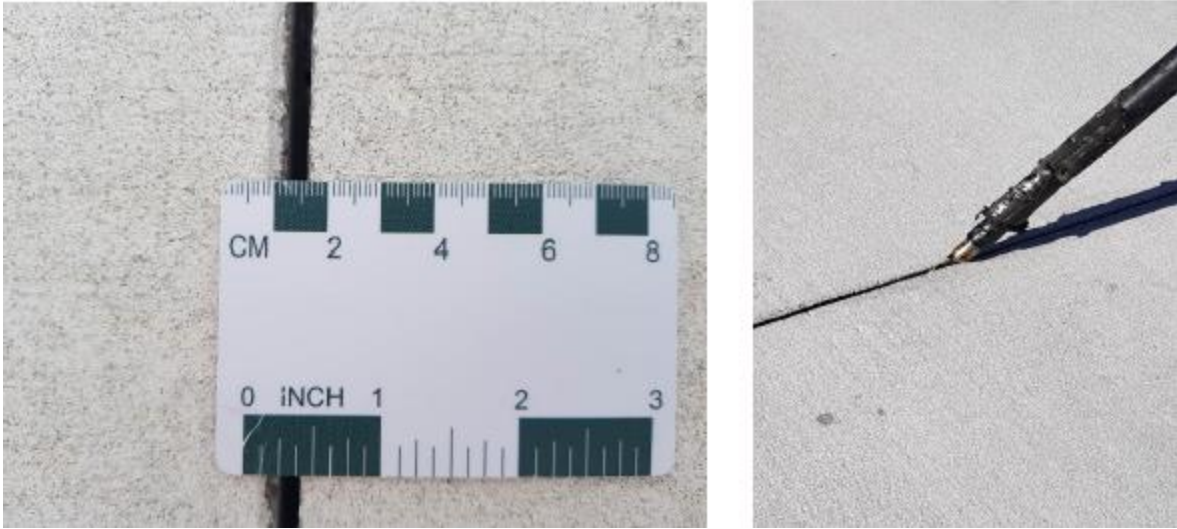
New joint design filled with a low-modulus joint sealant (MTO 2018).
